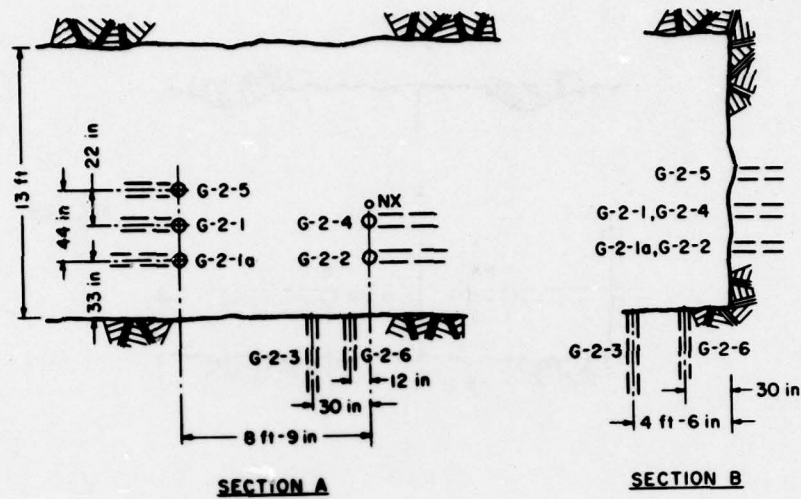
Detail plan and sections for site 2 -- tunnel G
